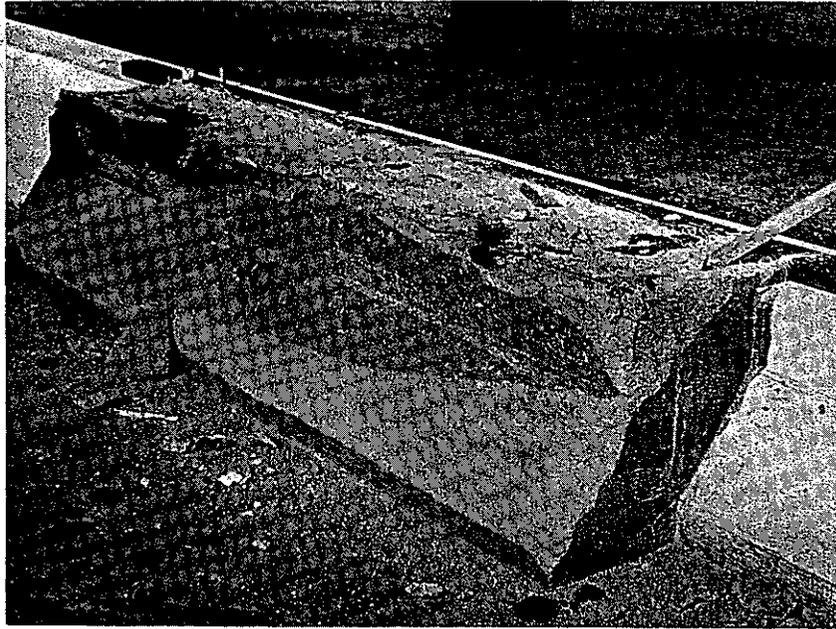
Damage to Vermiculite Concrete Block
